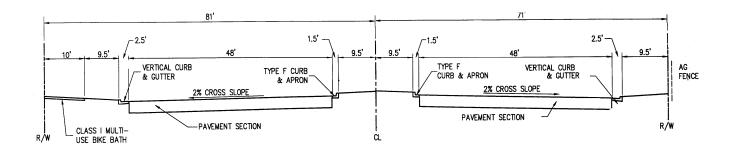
MOUNTAIN HOUSE PARKWAY - I 205 TO VON SOSTEN ROAD CROSS SECTION
